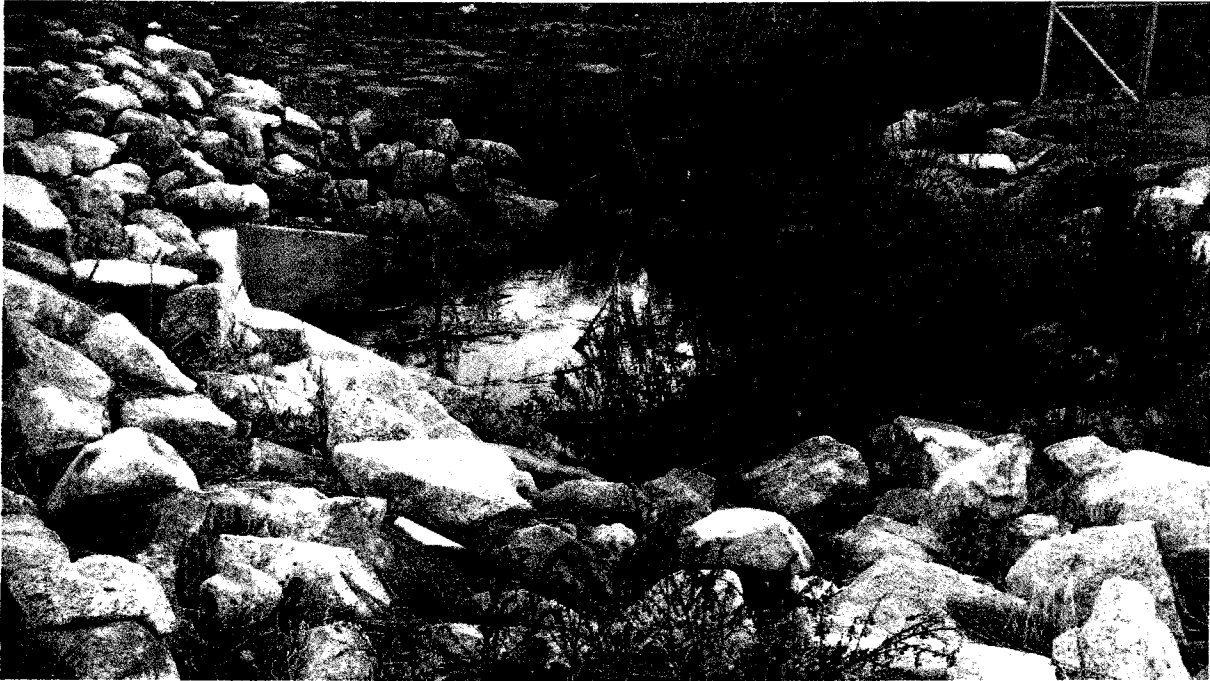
View of headwall and culvert (west of Pat's Ranch Road) entering site
